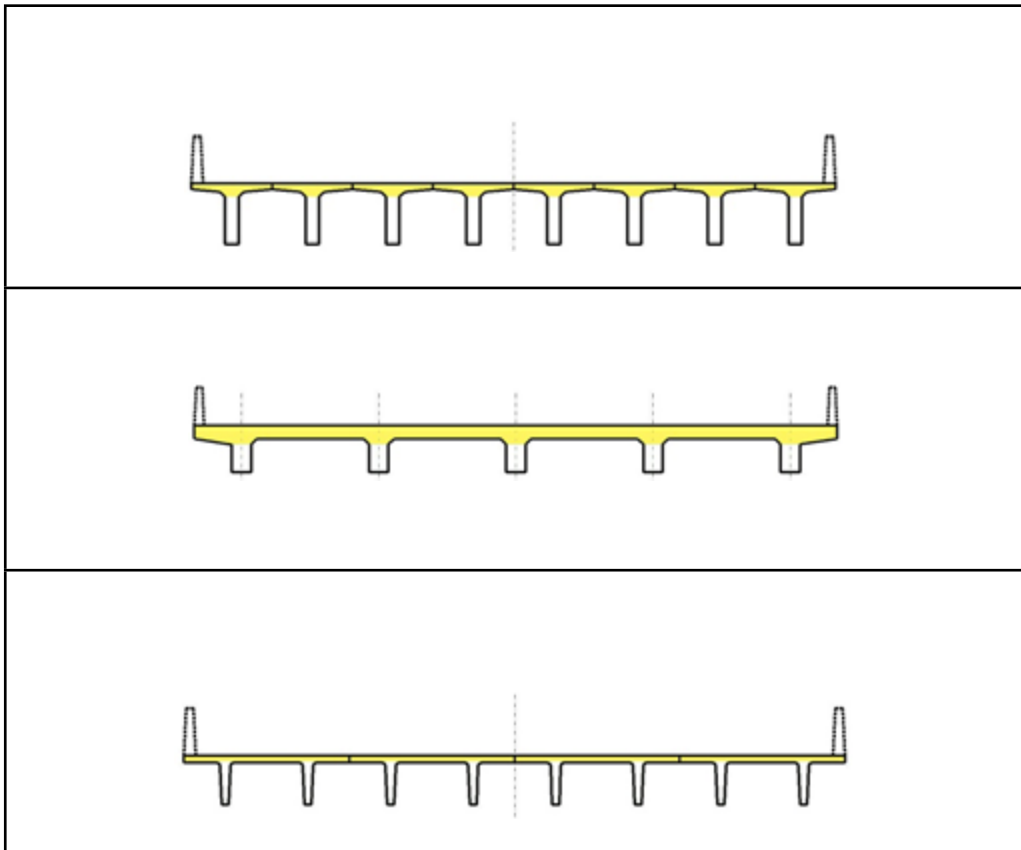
Reinforced Concrete Top Flange (Highlighted)
